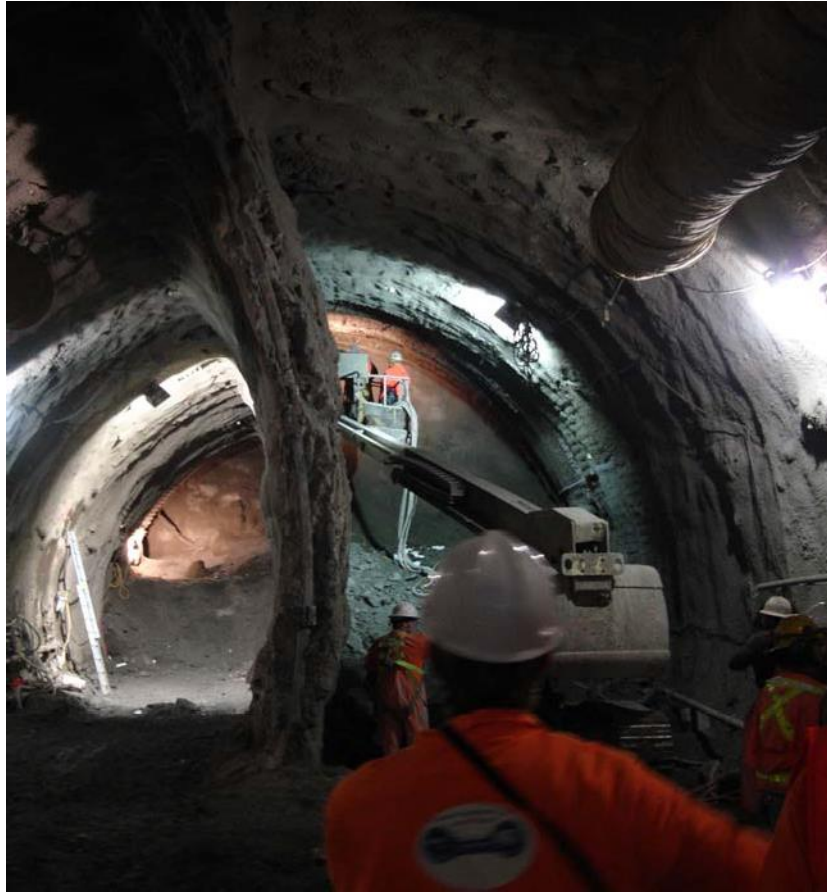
Typical Tunnel Excavation with Temporary Middle Wall (Beacon Hill Station, Washington)
